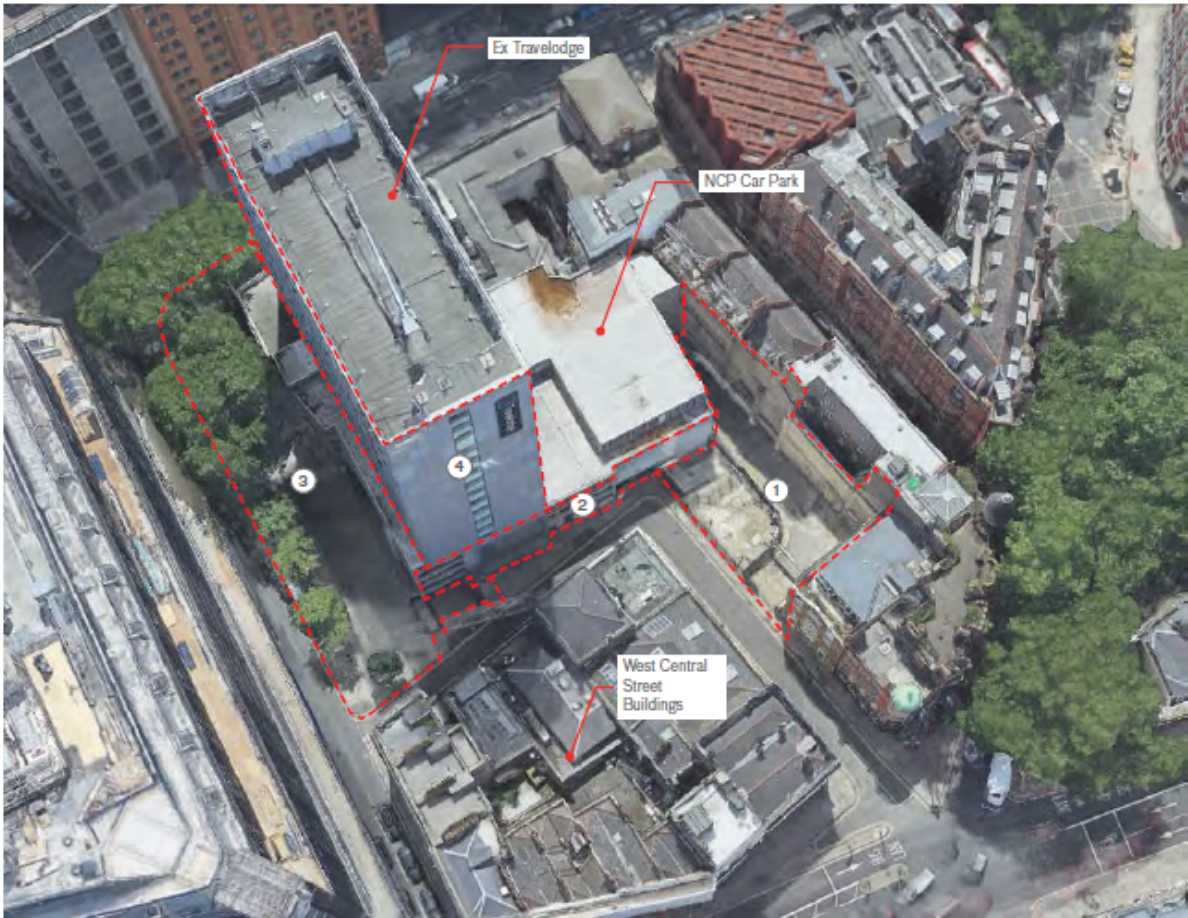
Existing travel Lodge, Selkirk House, 1 Museum Street
